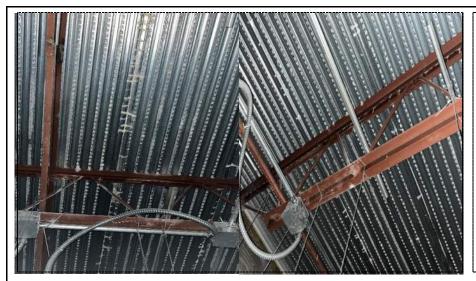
Evidence of roof leaks above ceilings in clasrooms-building 2.
